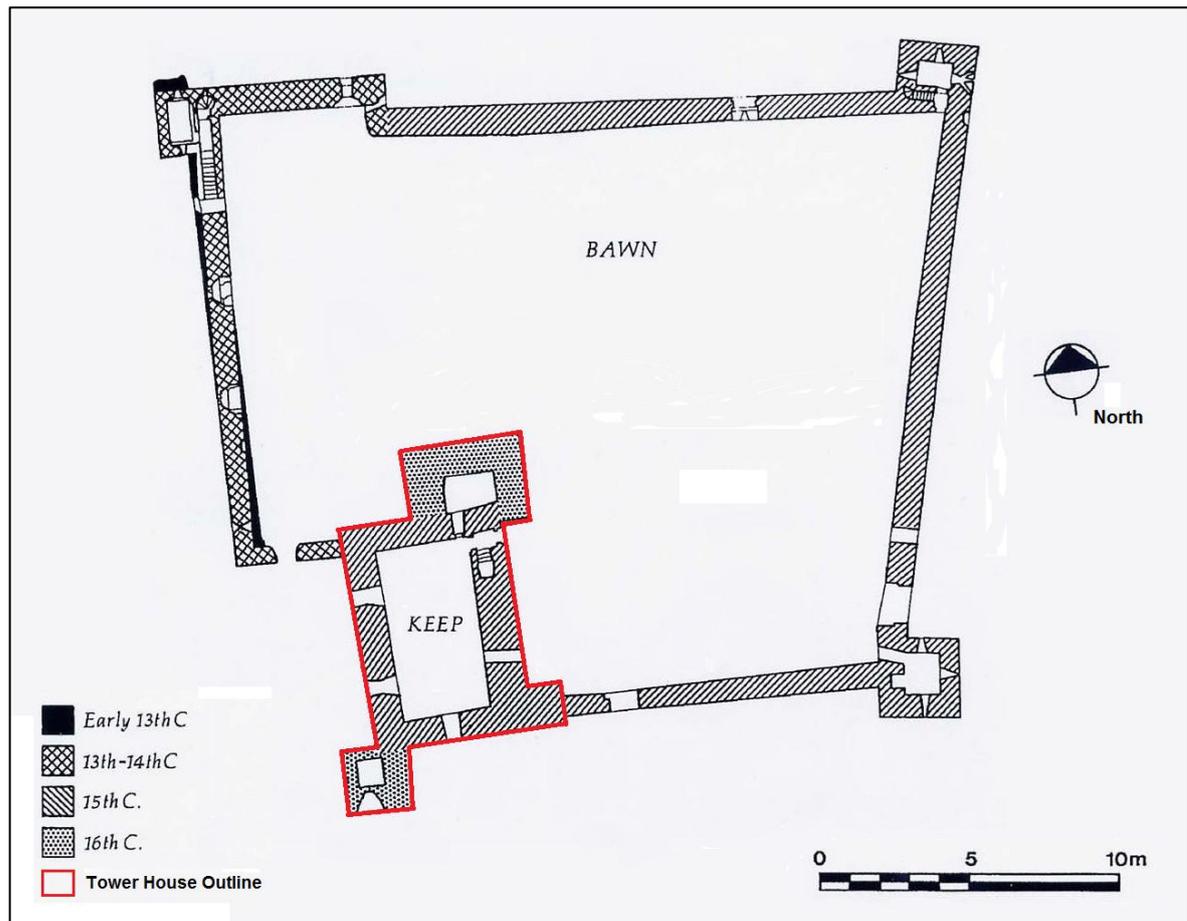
Plan layout of Barryscourt Tower House and outer bawn wall - Adjusted sketch from (Monk & Tobin, 1991)
